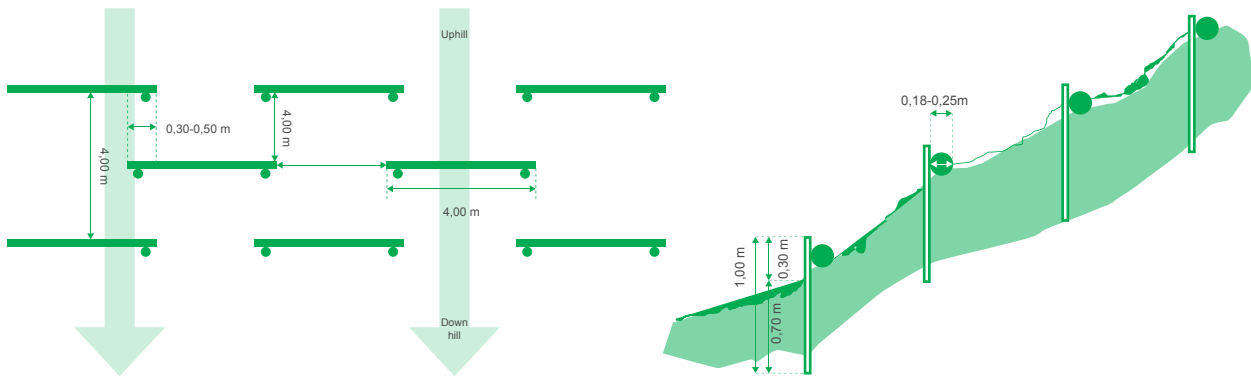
Scheme of pile wall distribution along the slope. View from above (left) and vertical scheme (right).
